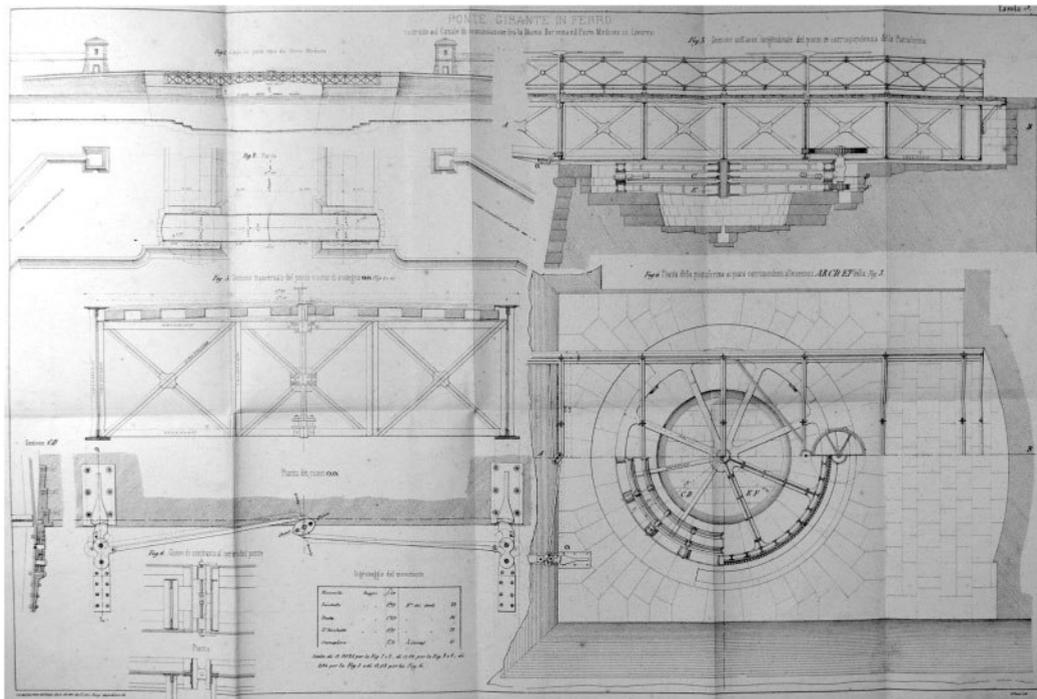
Construction details of the swing bridge built in the new dockyards of Livorno and inaugurated in 1868 (Mati 1869).
